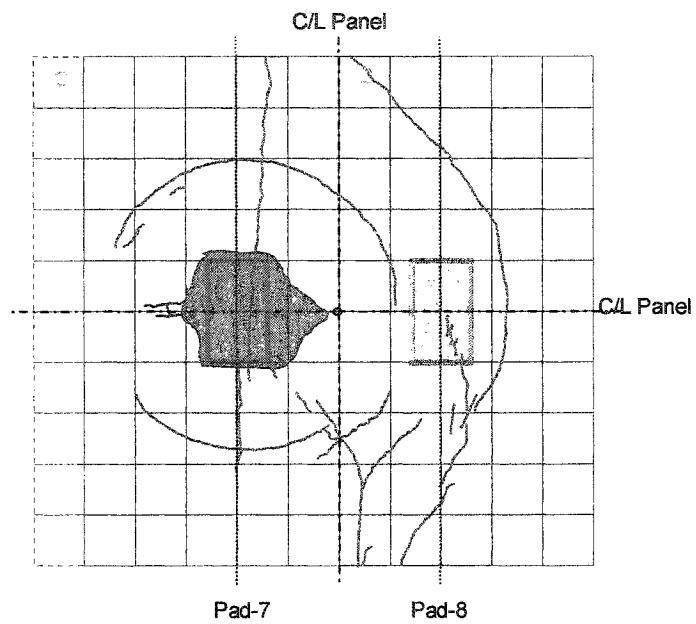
Panel-D: Crack Patterns on Top after Failure
